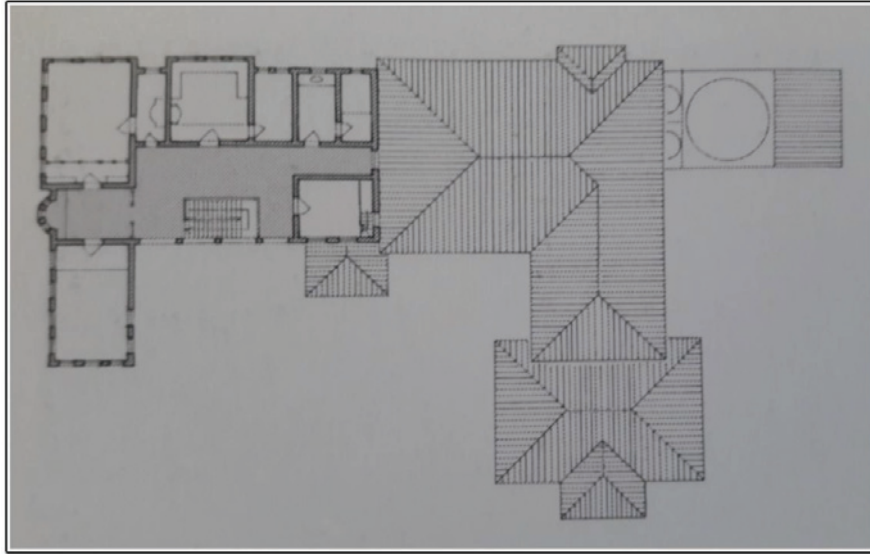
18<sup>th</sup> century house: Second floor plan of the house in Vezir Köprü.
